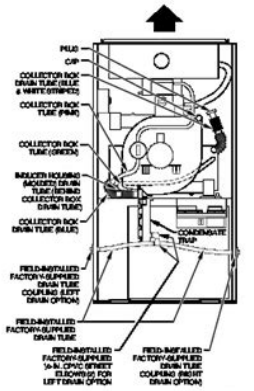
Factory-Shipped Upflow Tube Configuration (Shown With Blower Access Panel Removed)
